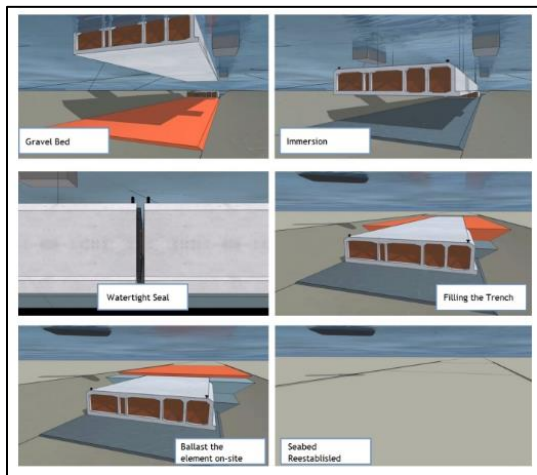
Immersed Tube Tunnel Stages of Construction Part 2 (Immersed tube tunnel (n.d.)).
